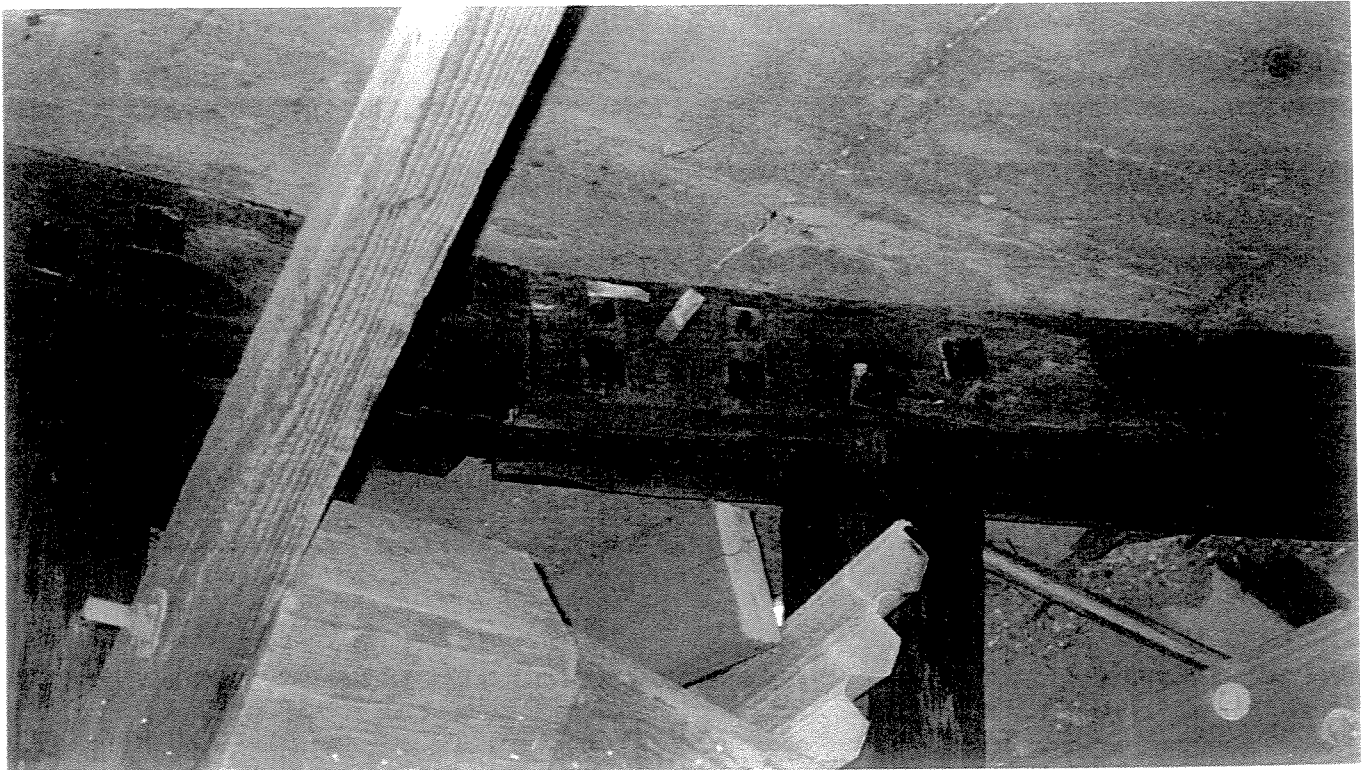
Bent 78 piles "D" and "E," splice in timber pile cap beam with displaced "E" pile and broken cap. Timber cap to the north of the splice is satisfactory, looking SE.
